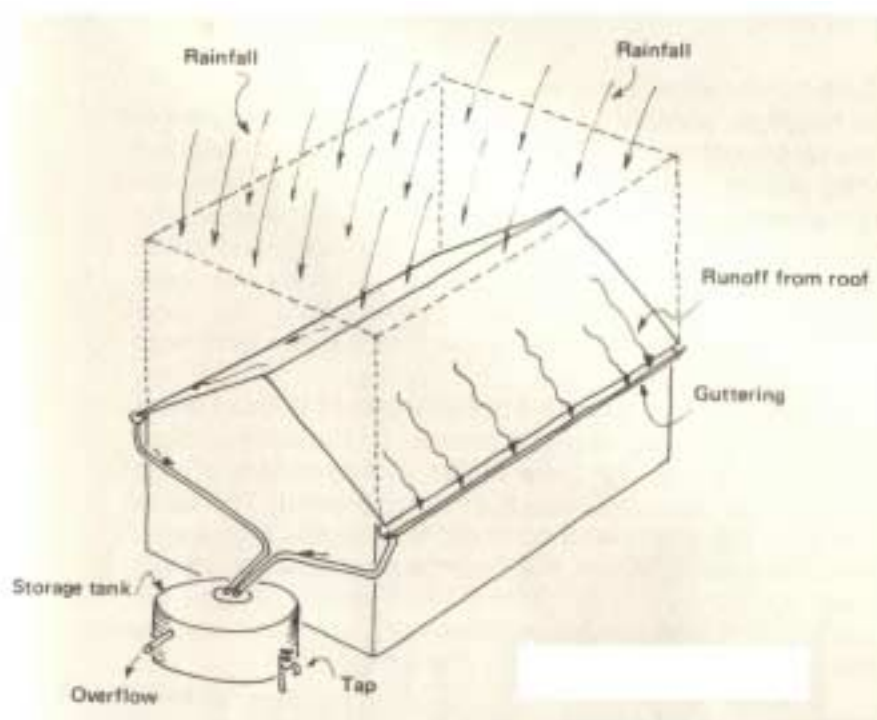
Arrangement of roof catchment tank (from Watt 1978)
